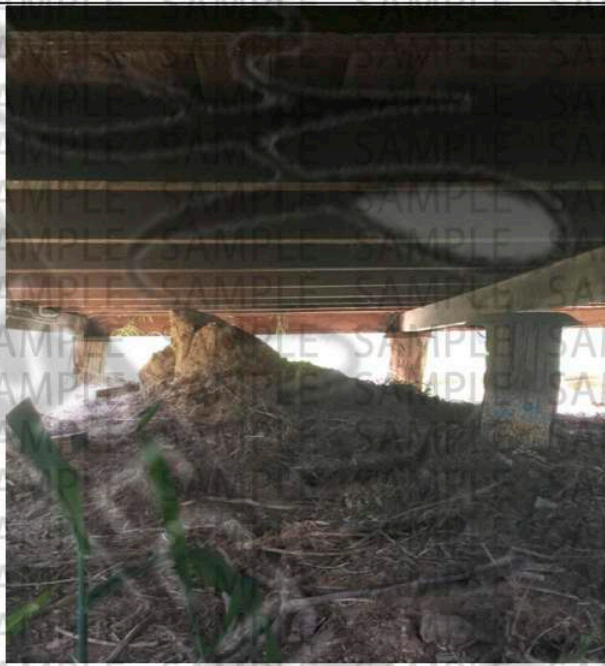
There is a pile of concrete & sand blend piled under the front RH extension. This should be removed away from the floor timbers as it poses a risk for entry by termites.
